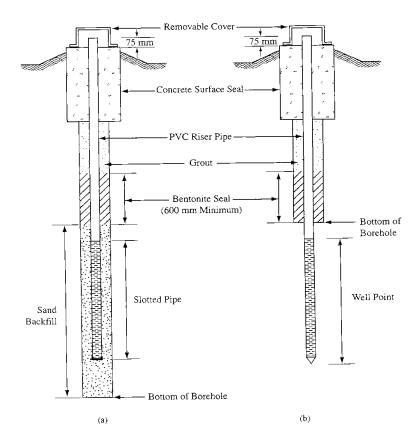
Representative Details of Observation Well Installations. (a) Drilled-in-place Stand-Pipe Piezometer, (b) Driven Well Point.
